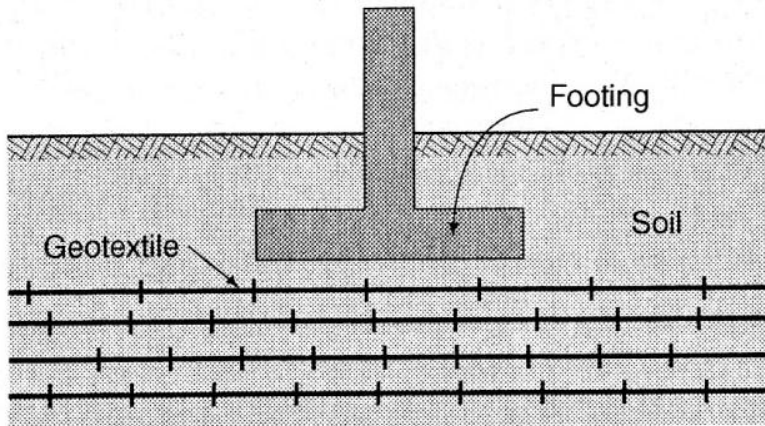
Geotextiles used to improve the bearing capacity of foundations.
